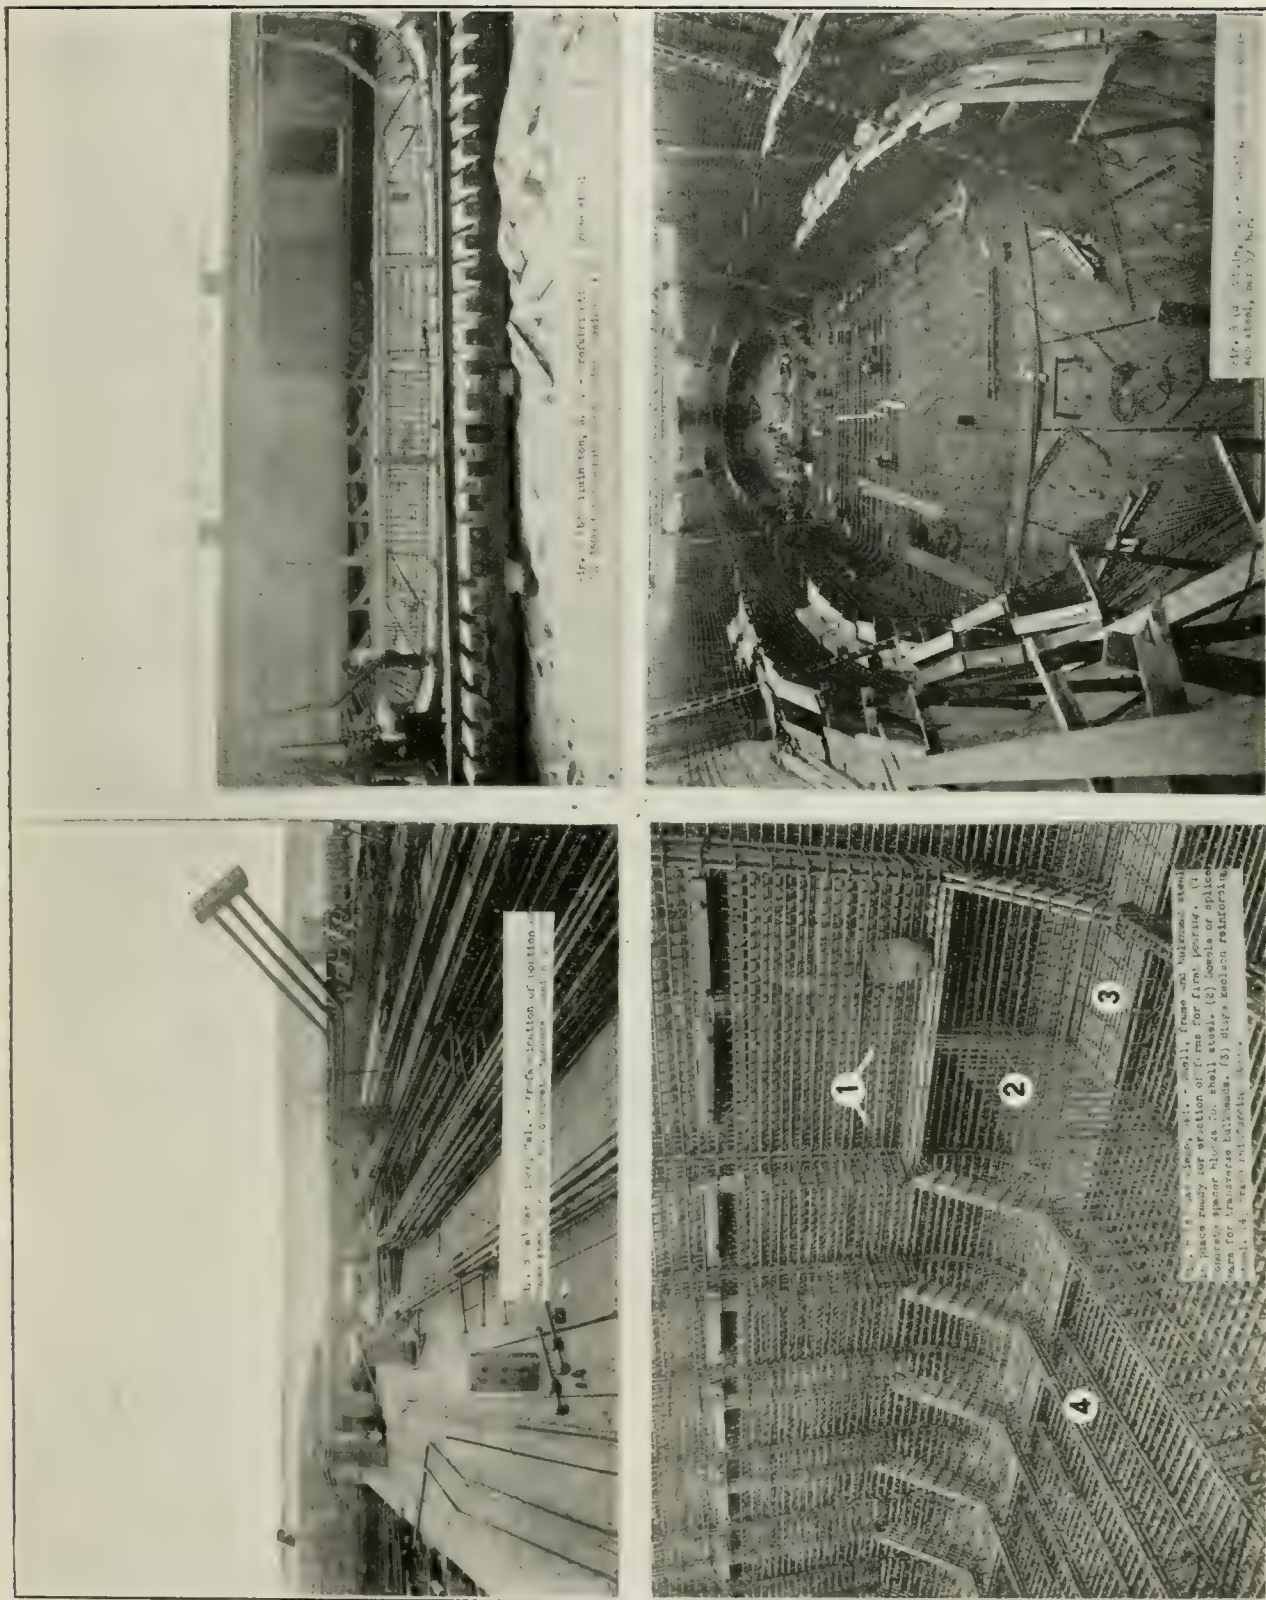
BOTTOM AND SIDE FRAME STEEL AND THE KEELSON REINFORCING STEEL IS ERECTED. SPLICE BARS BETWEEN THE BULKHEADS AND SHELL ARE PLACED IN POSITION.
